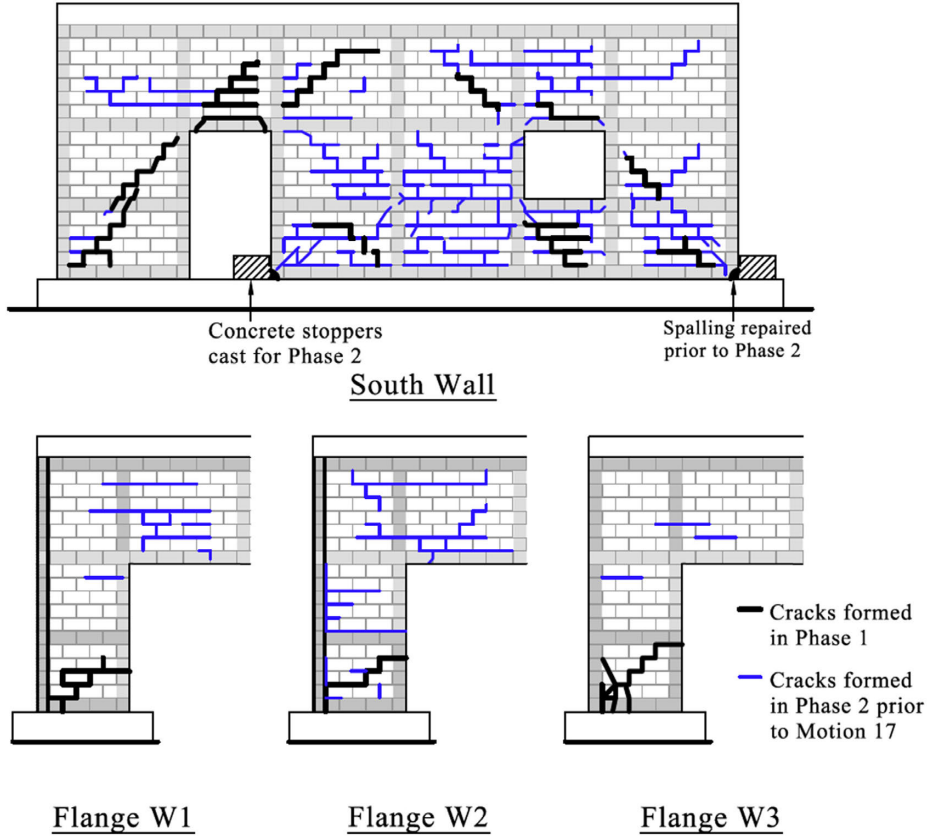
Cracks formed in the south wall and wall flanges in Phase 1 and Phase 2 up to Motion 16.
